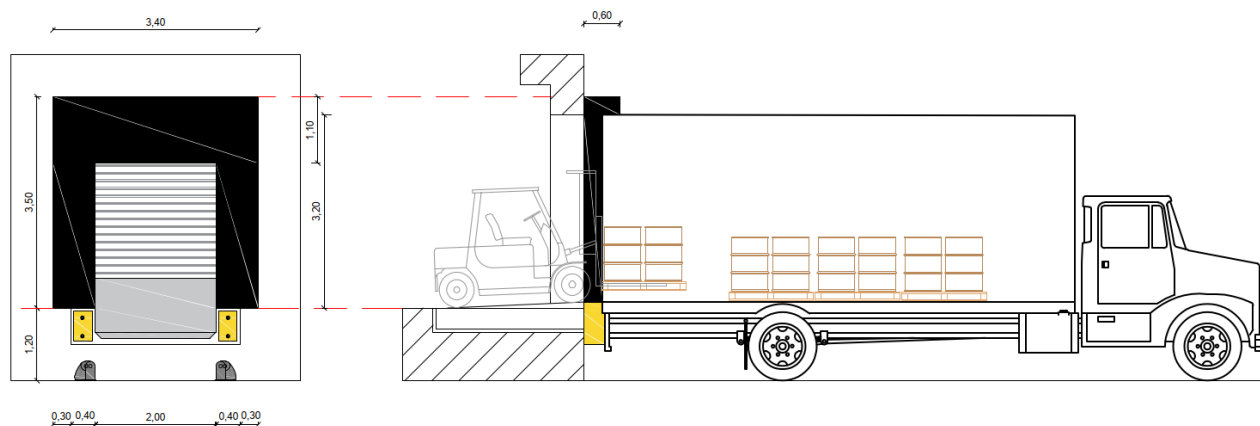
Dimensioning of loading/unloading bays: front view (left) and lateral view (right)
